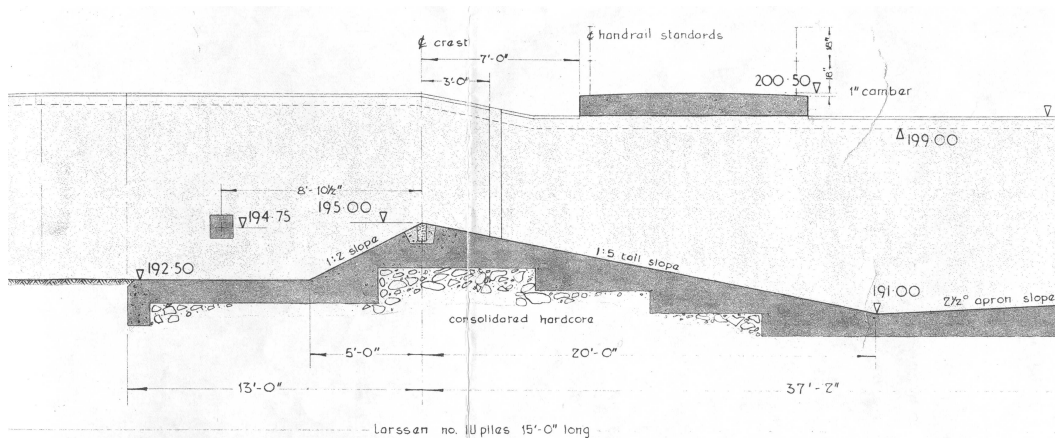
Brimpton weir: Low-flow longitudinal section (adapted from the original Environment Agency (1966) construction drawing)
